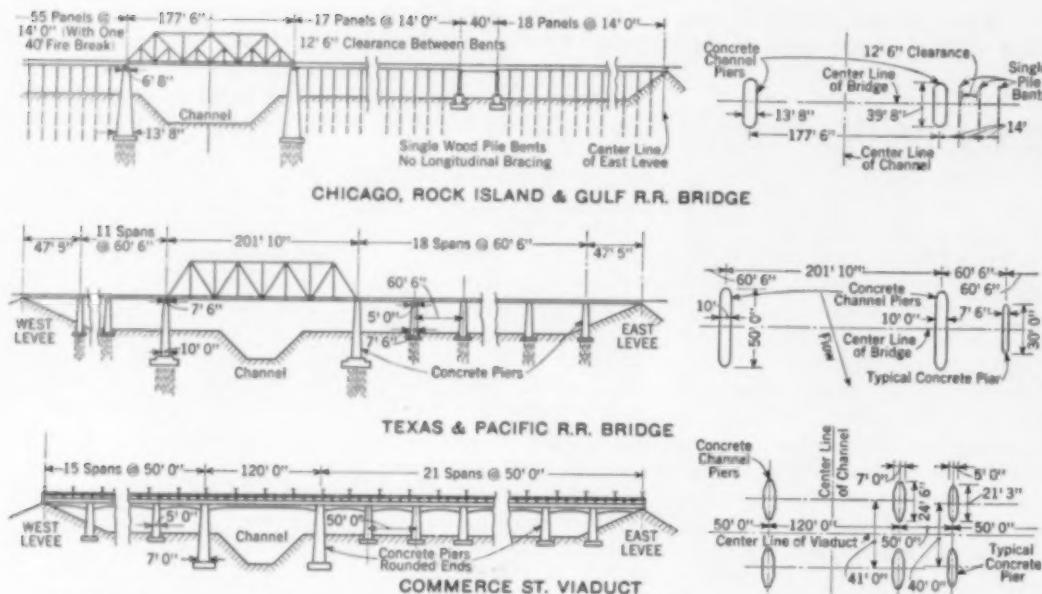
PARTIAL PROFILES AND DETAILED PIER PLANS OF THREE FLOODWAY CROSSINGS
